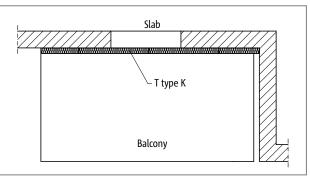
Schöck Isokorb® T type K: Balcony with facade offset
